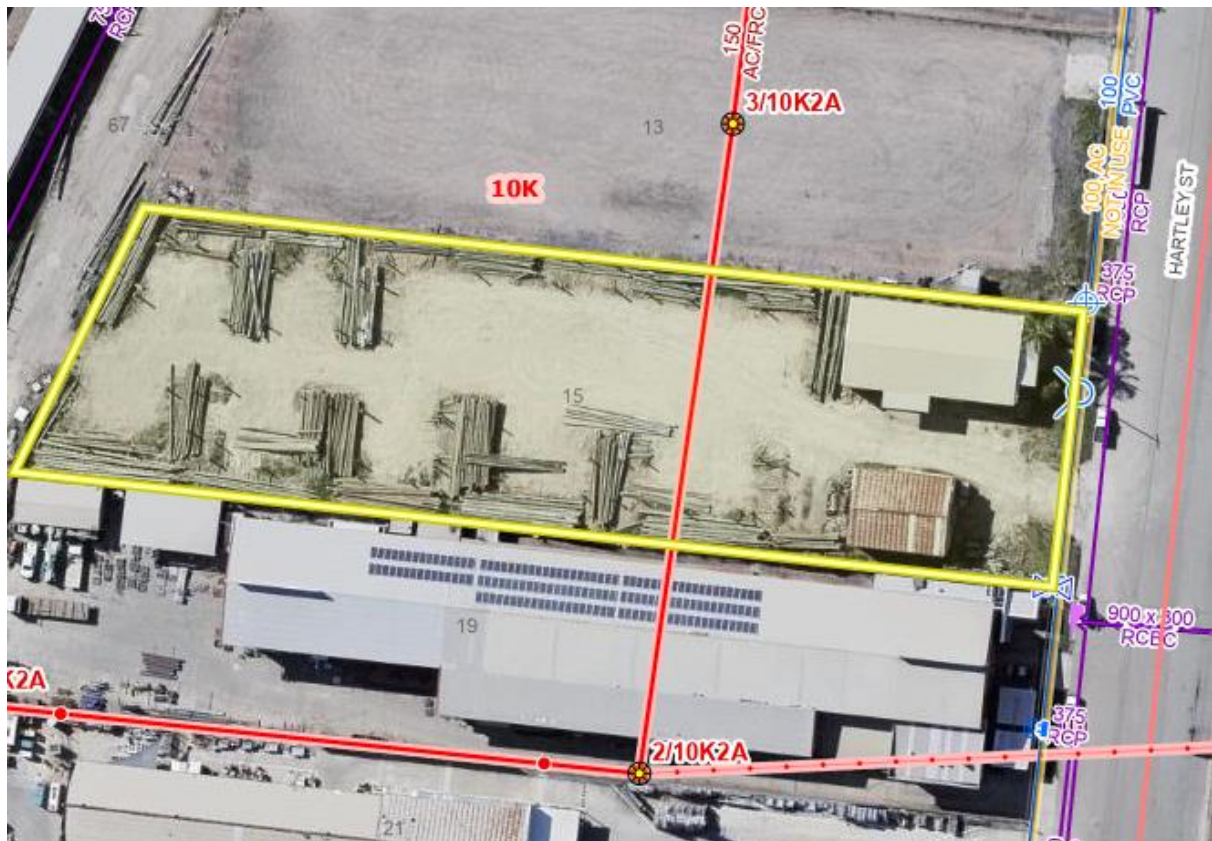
Existing Infrastructure (TownsvilleMAPS - Community)
